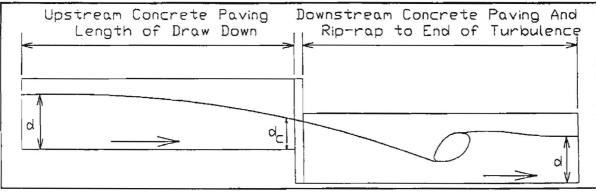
Profile View of Typical Straight Drop Spillway
